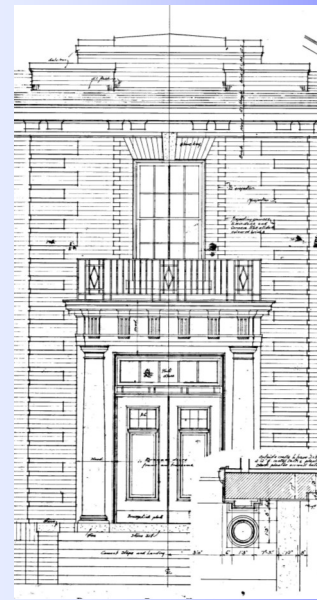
Assiniboia Court House (Original elevation drawing: Maurice Sharon Architect, 1930)
